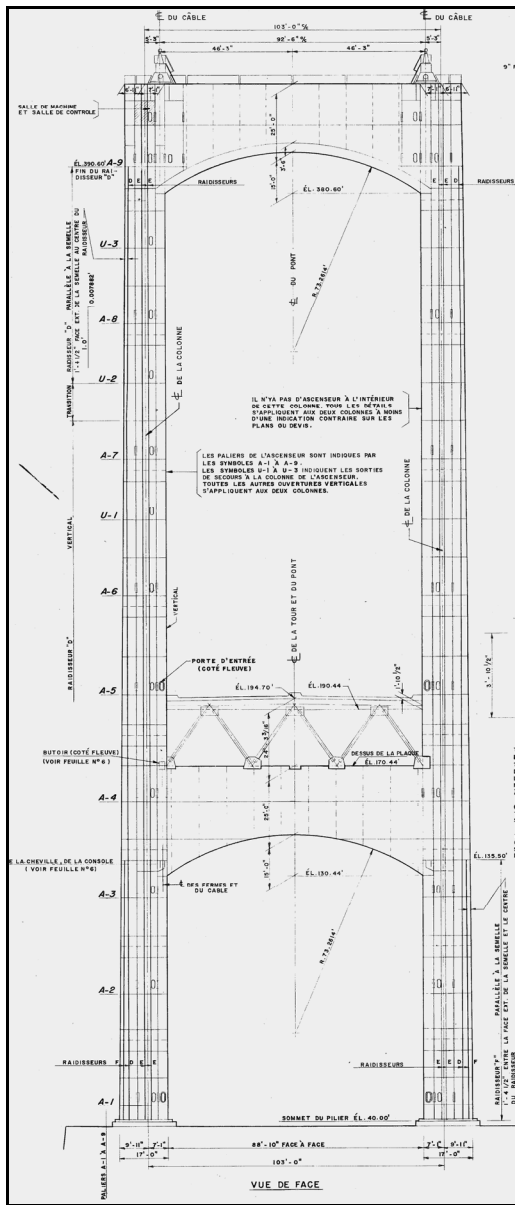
Front elevation layout of towers (Ministère des Transports du Québec)
